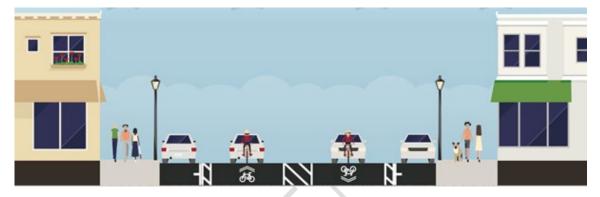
Potential cross section of Newcastle Street (slow speed mixed traffic).
